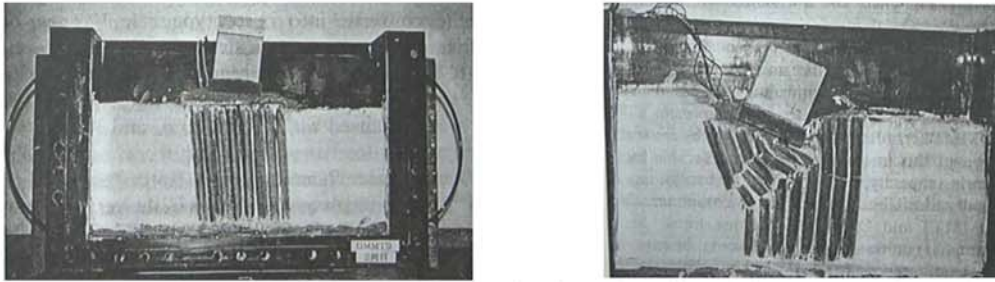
Column tilting and column bending (Kitazume et al. 2000)
